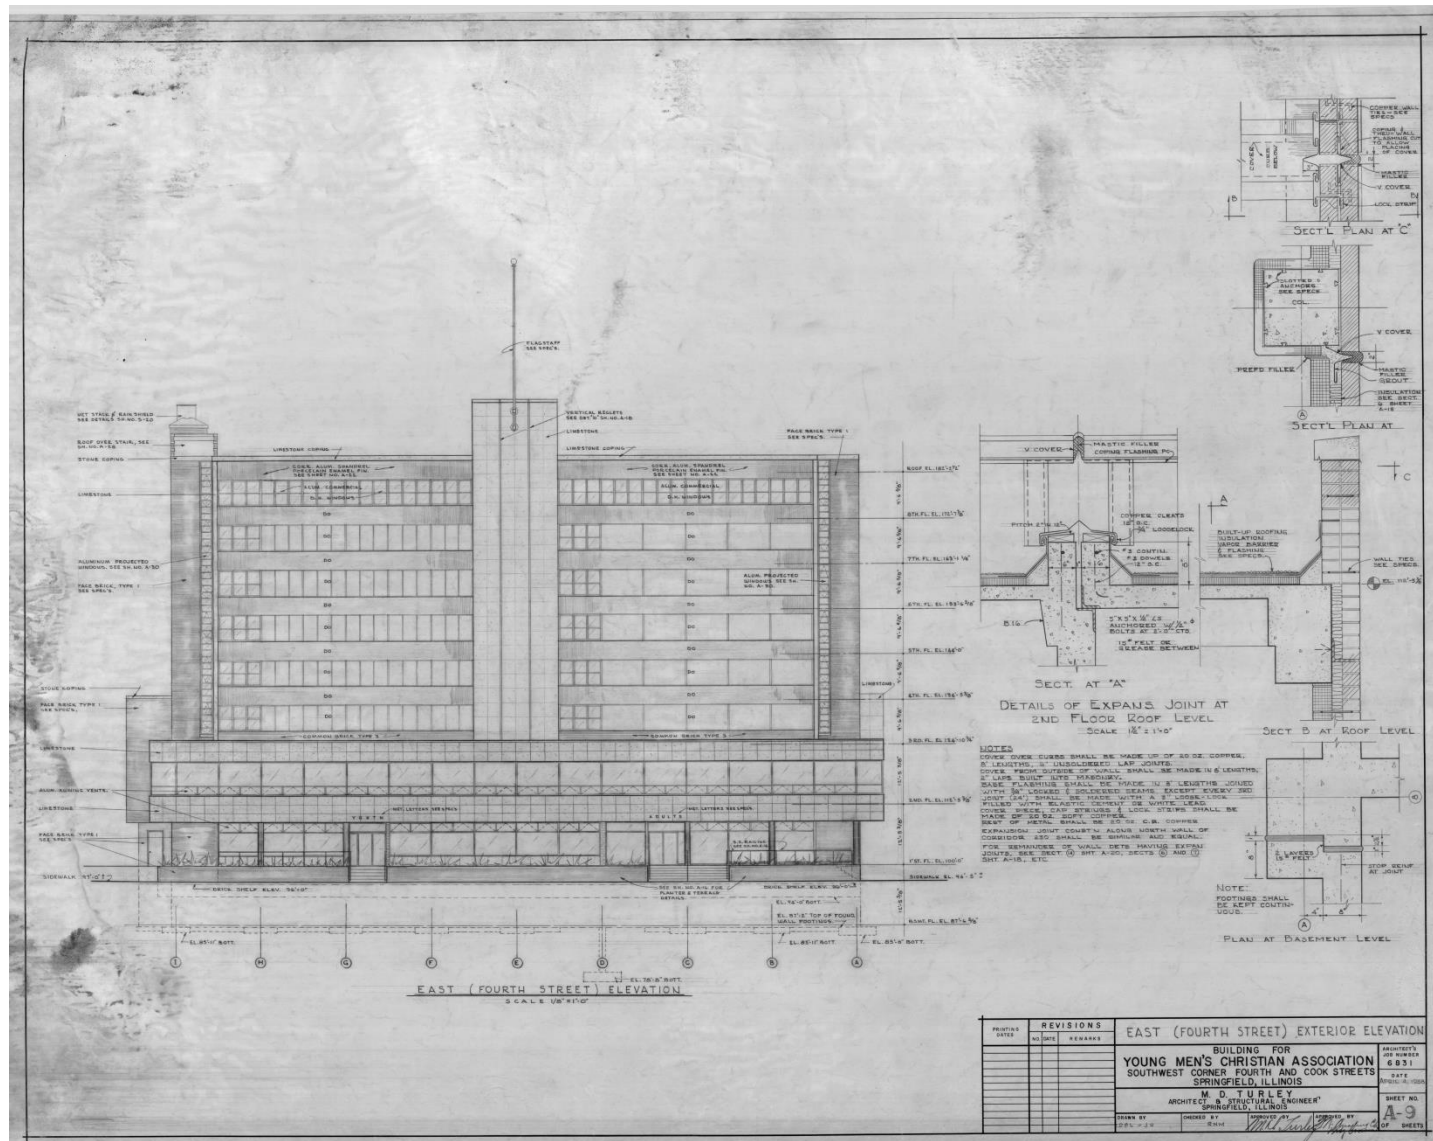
East (Fourth Street) Exterior Elevation, Building for Young Men's Christian Association (Turley 1958: Sheet No. A-9).
